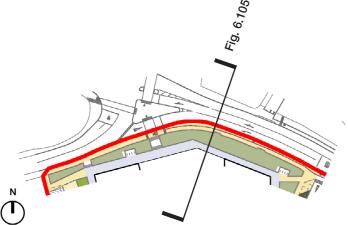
Street coding plan: along Cambridge Road (north of Plot C).
